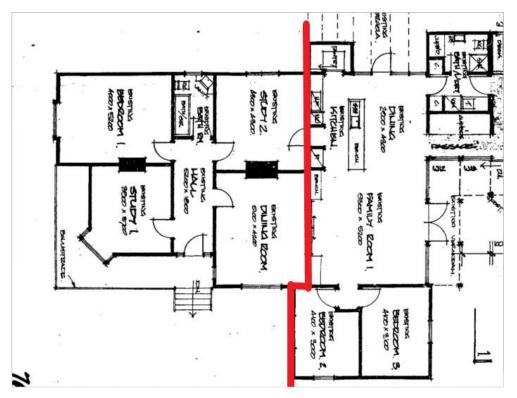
Floor plan from 1984 showing the same plan form of the house as in 1926, apart from the removal of the rear lean-to and construction of additions (to the right of the red line). (Source: City of Camberwell, building permit No. 76295)
